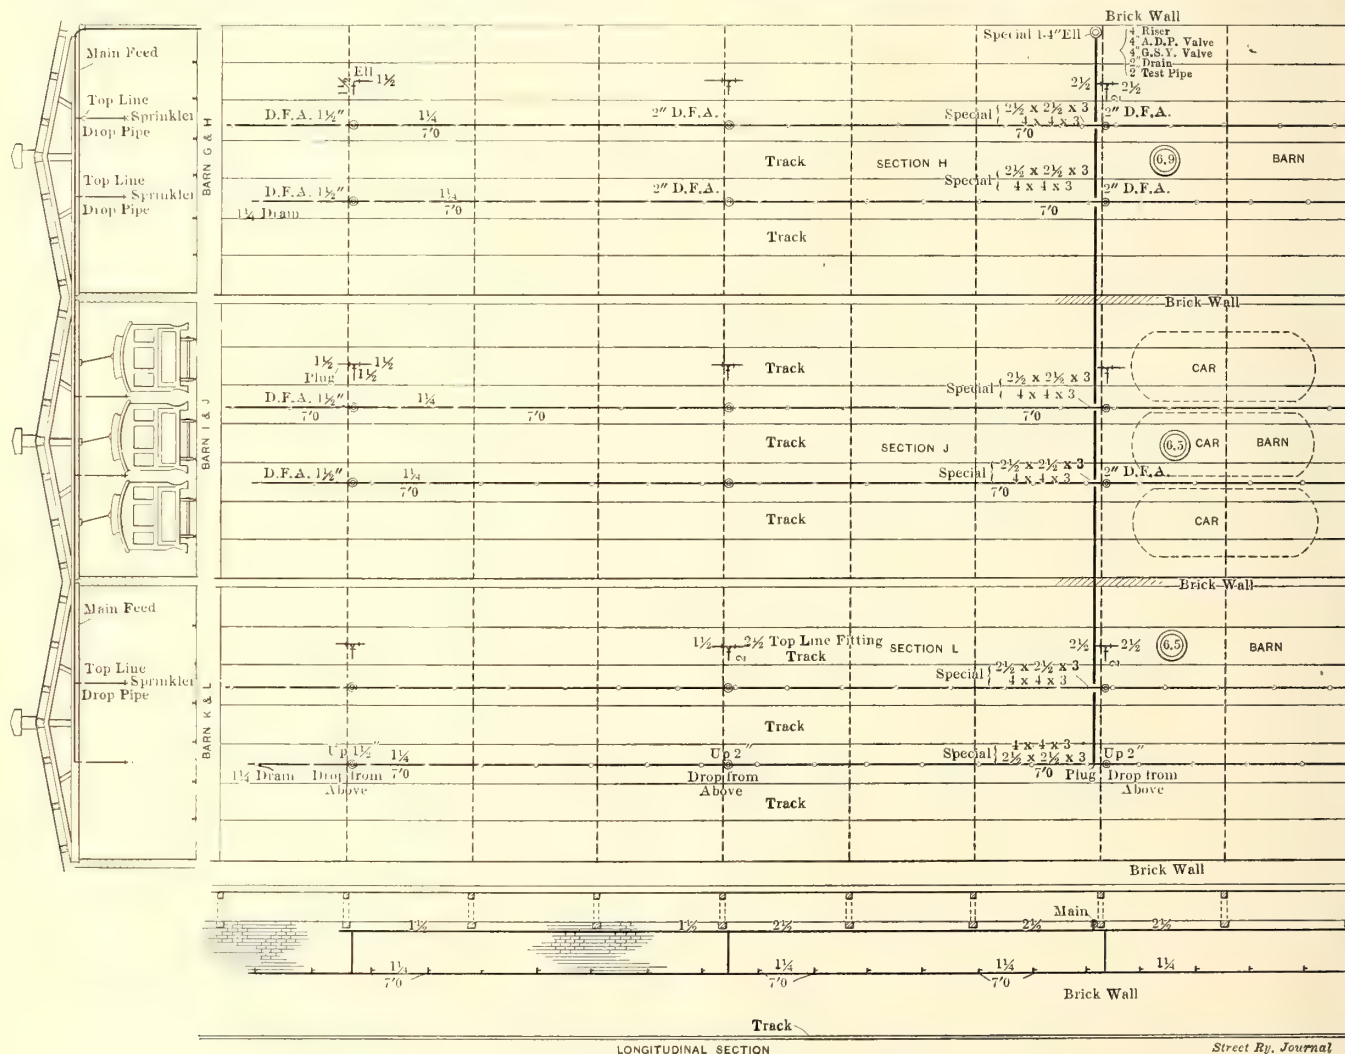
PART OF SPRINKLER LAYOUT IN THE CAR HOUSE
